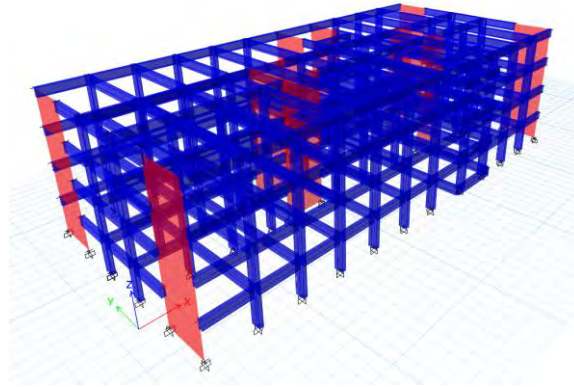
3D View 4 Storey Building with Shear Wall.
